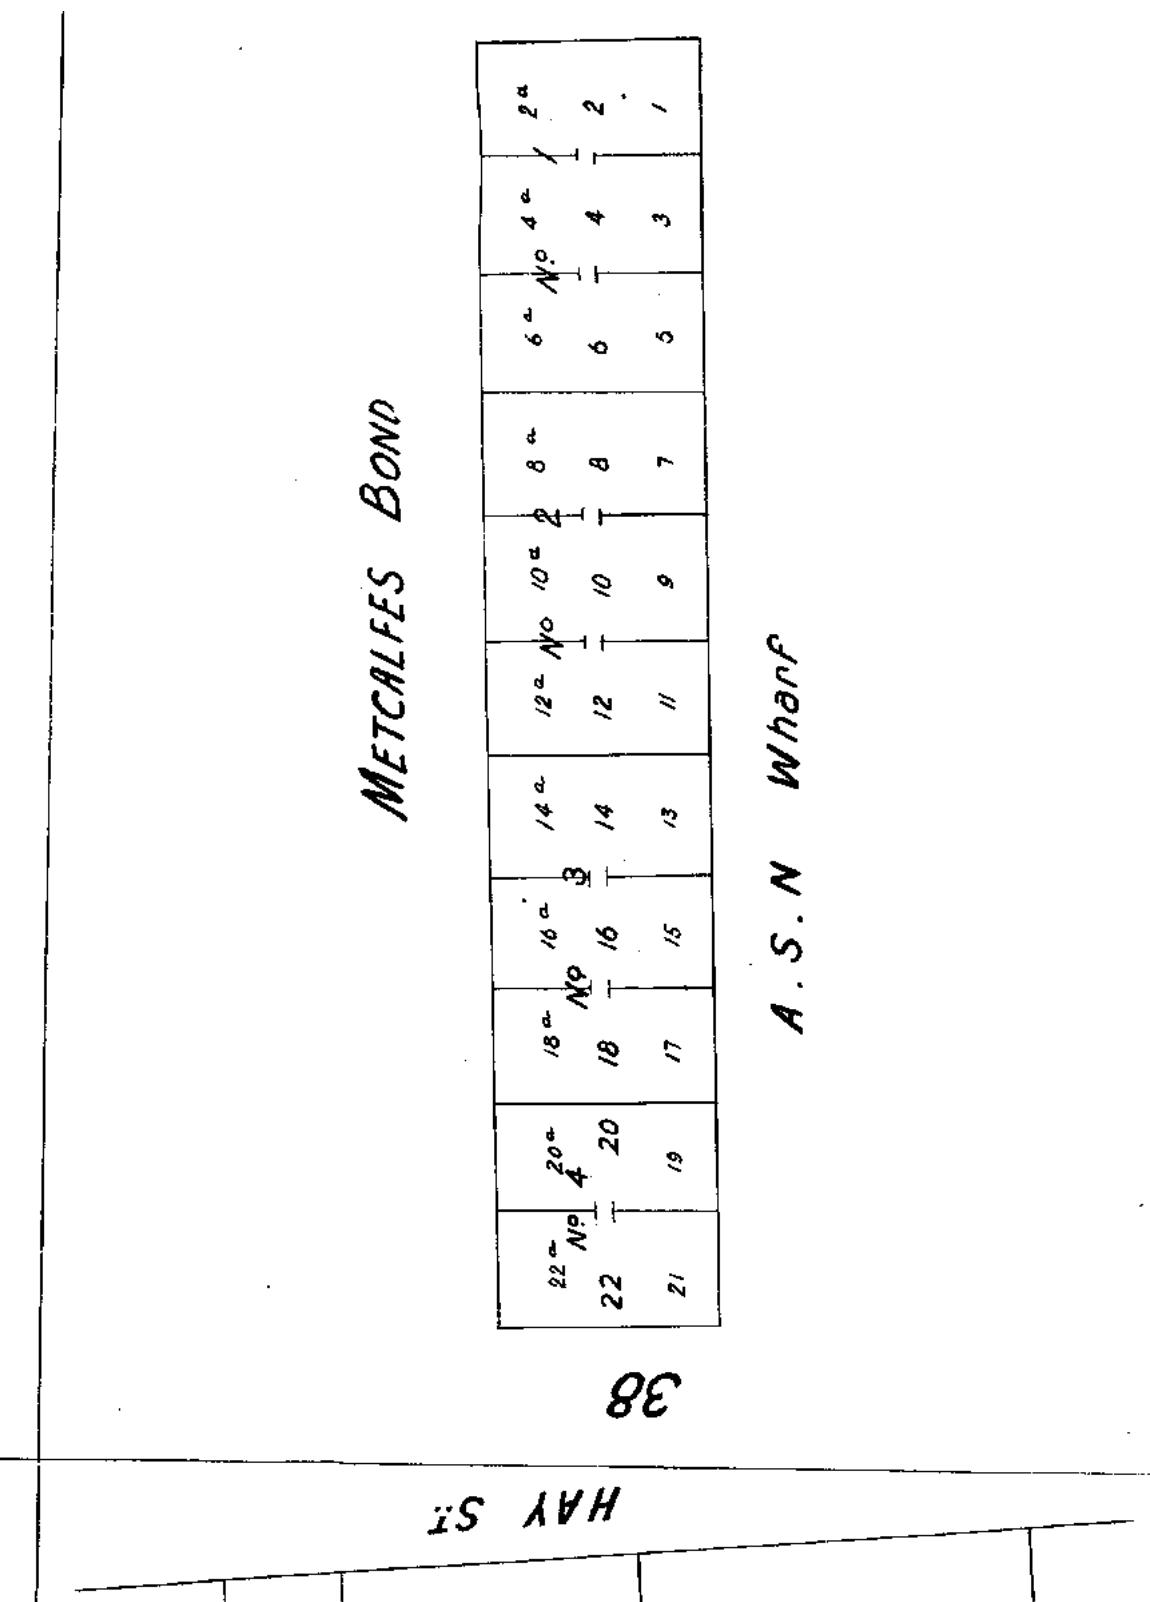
Metcalfe Bond, 1887. HP Dove's plan of 1887 showing layout of the Stores with enlargement to three storeys from the original two. (Source: HP Dove, *Plans of Sydney Executed for Insurance Companies*, Sydney, 1882)
